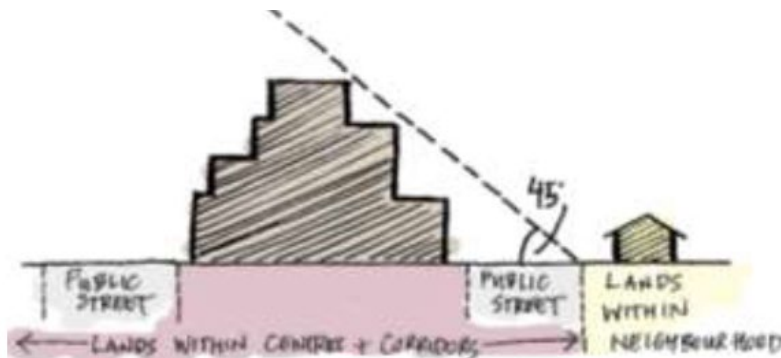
Angular plane when a street separates Neighbourhood designation from Centre or Corridor.
